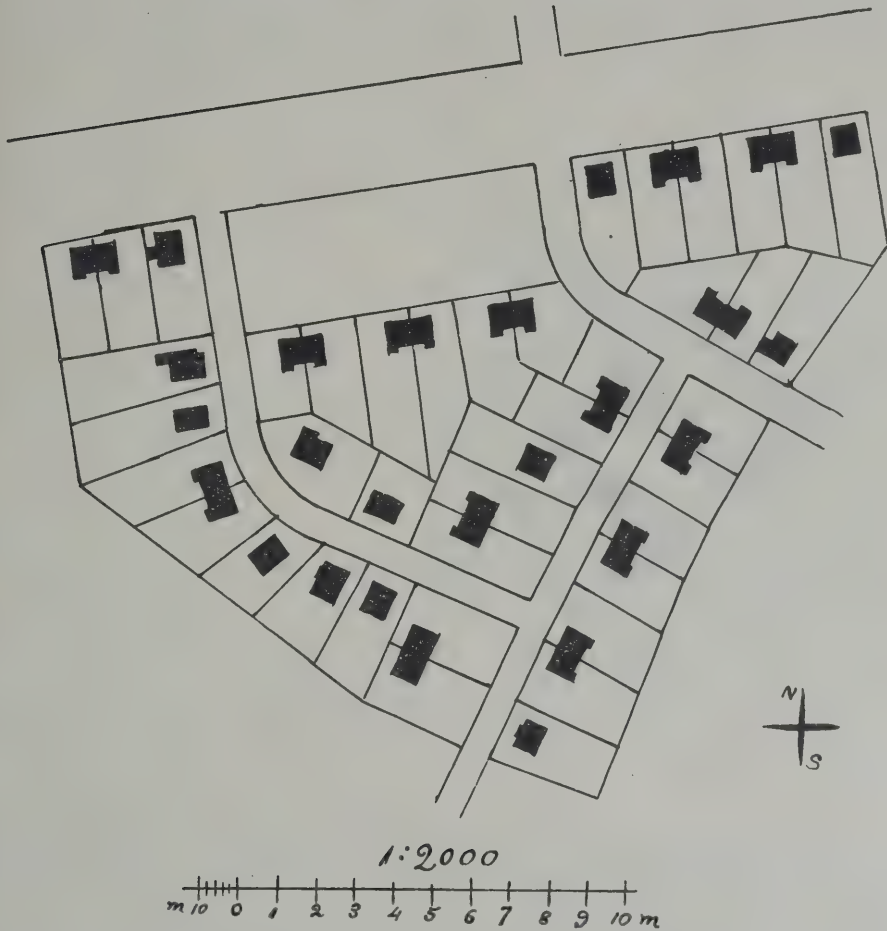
PLAN OF ONE-STOREY HOUSES BUILT BY THE BUILDING SOCIETY "GROENDALS VAENGE".
